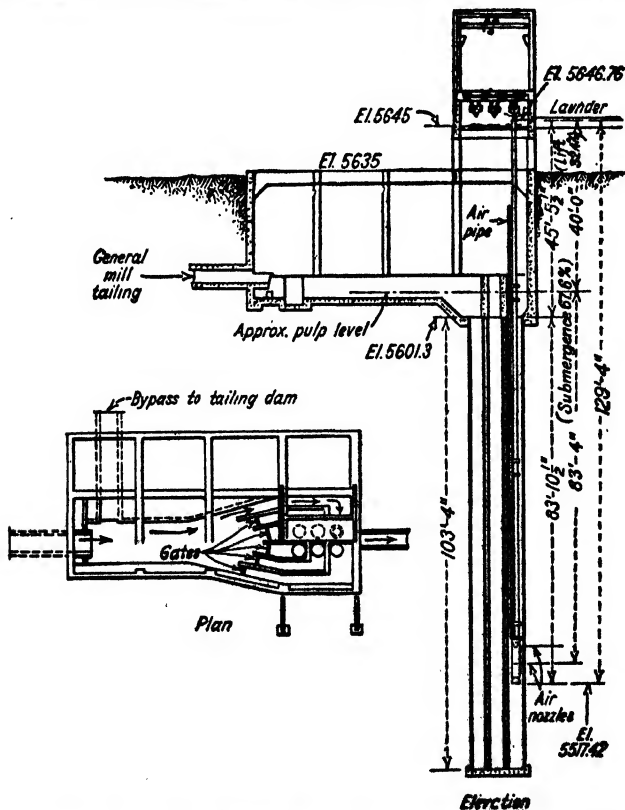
Arrangement of tailing air-lift at CHINO COPPER CO.
